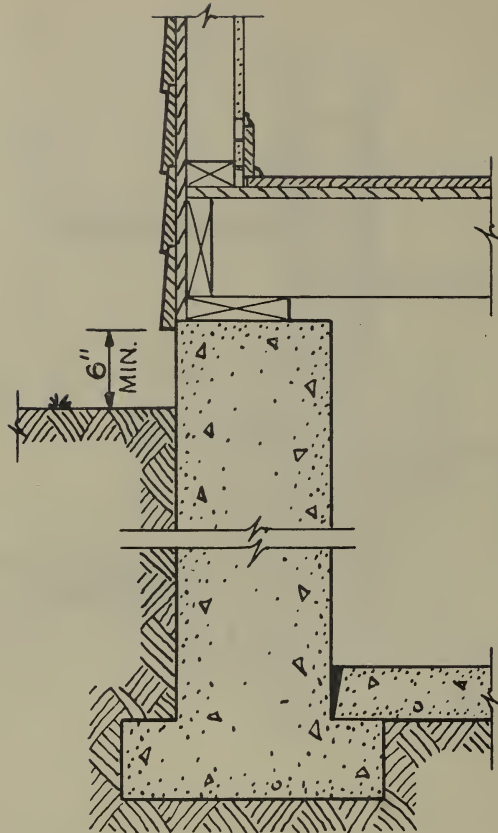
POURED CONCRETE FOUNDATION WALLS OR PIERS that are easily inspected offer complete protection against hidden termite infestation. All form boards and wood debris must be removed from the soil. Expansion joints should be filled with coal-tar pitch.
